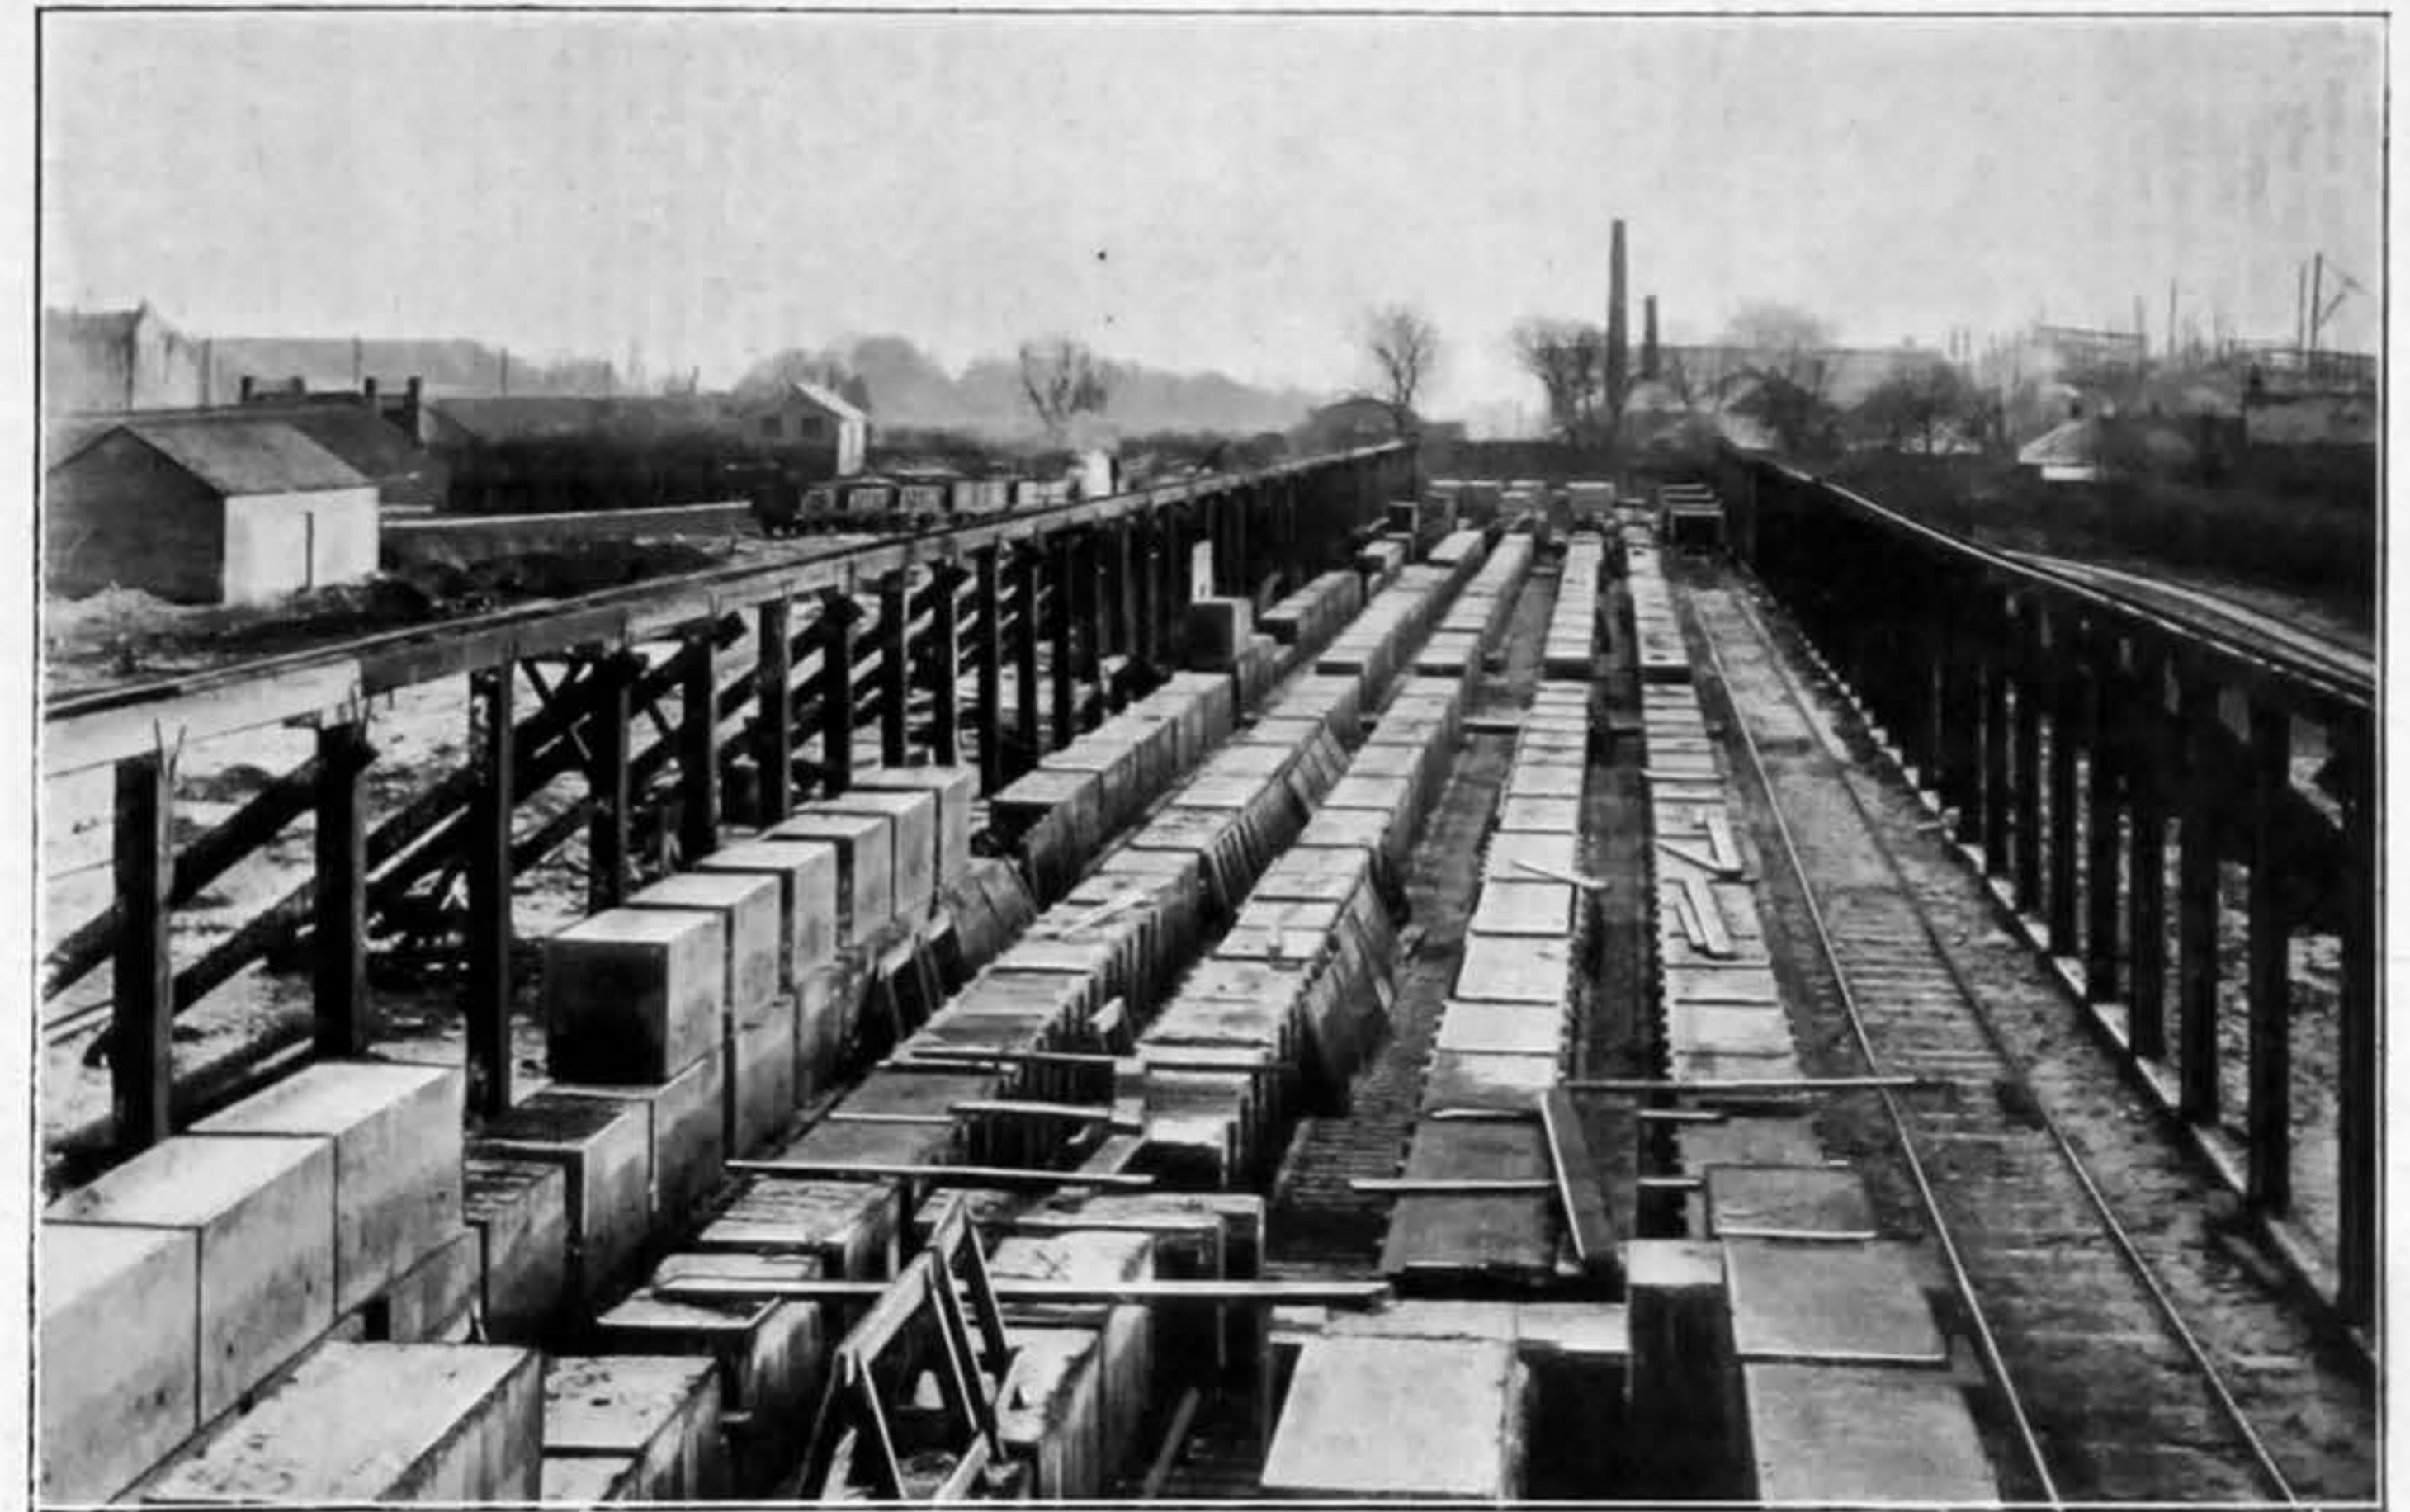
CONCRETE BLOCK MOULDING PLATFORM
